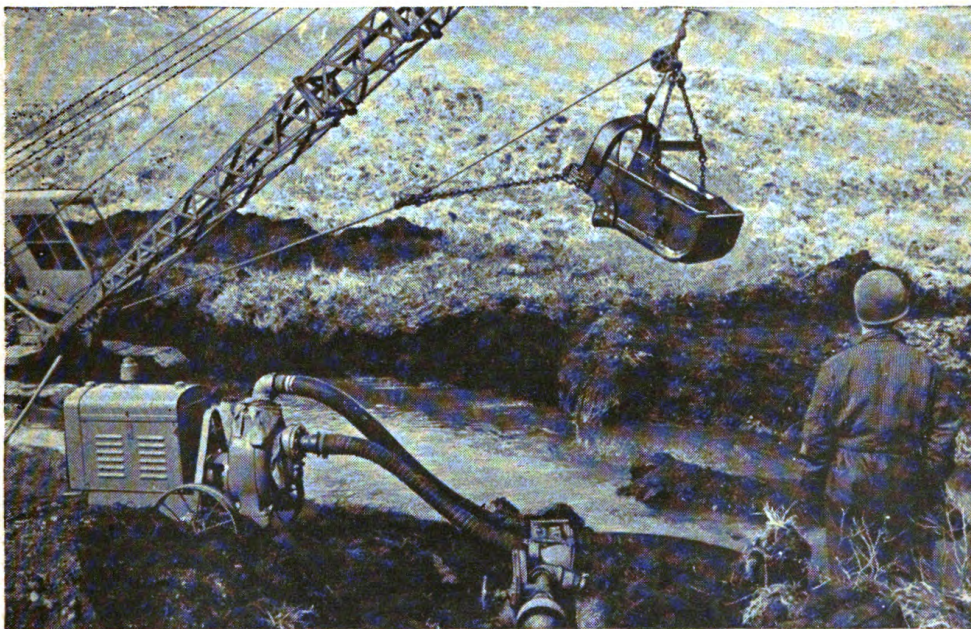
Centrifugal pump taking water from a drainage sump being excavated by a dragline.
